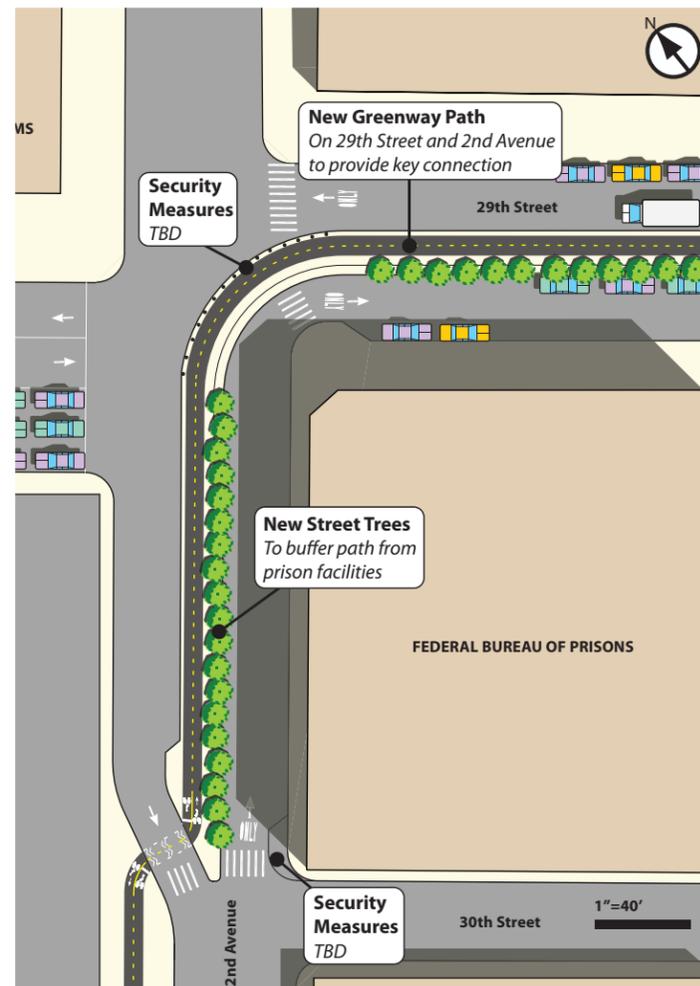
Possible configuration of 29th Street and Second Avenue connection in front of the Federal Bureau of Prisons
